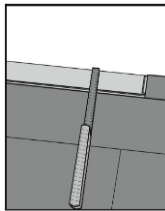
Last row (and perhaps also first row). The Minimum width of the last plank should be NOT LESS than 50 mm. Remember distance to wall is 12-15 mm. Tip! Put a spacer before measuring Cut the panels lengthwise and glue the short ends. See instructions below.
